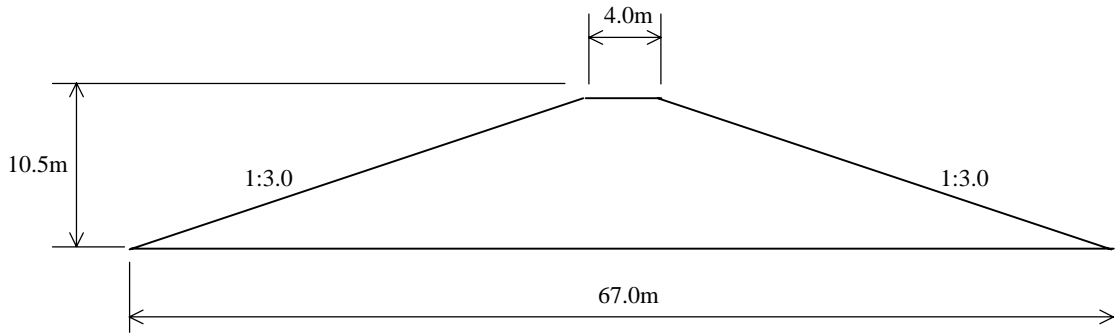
General Section of Ho Thanh Reservoir's Dam
